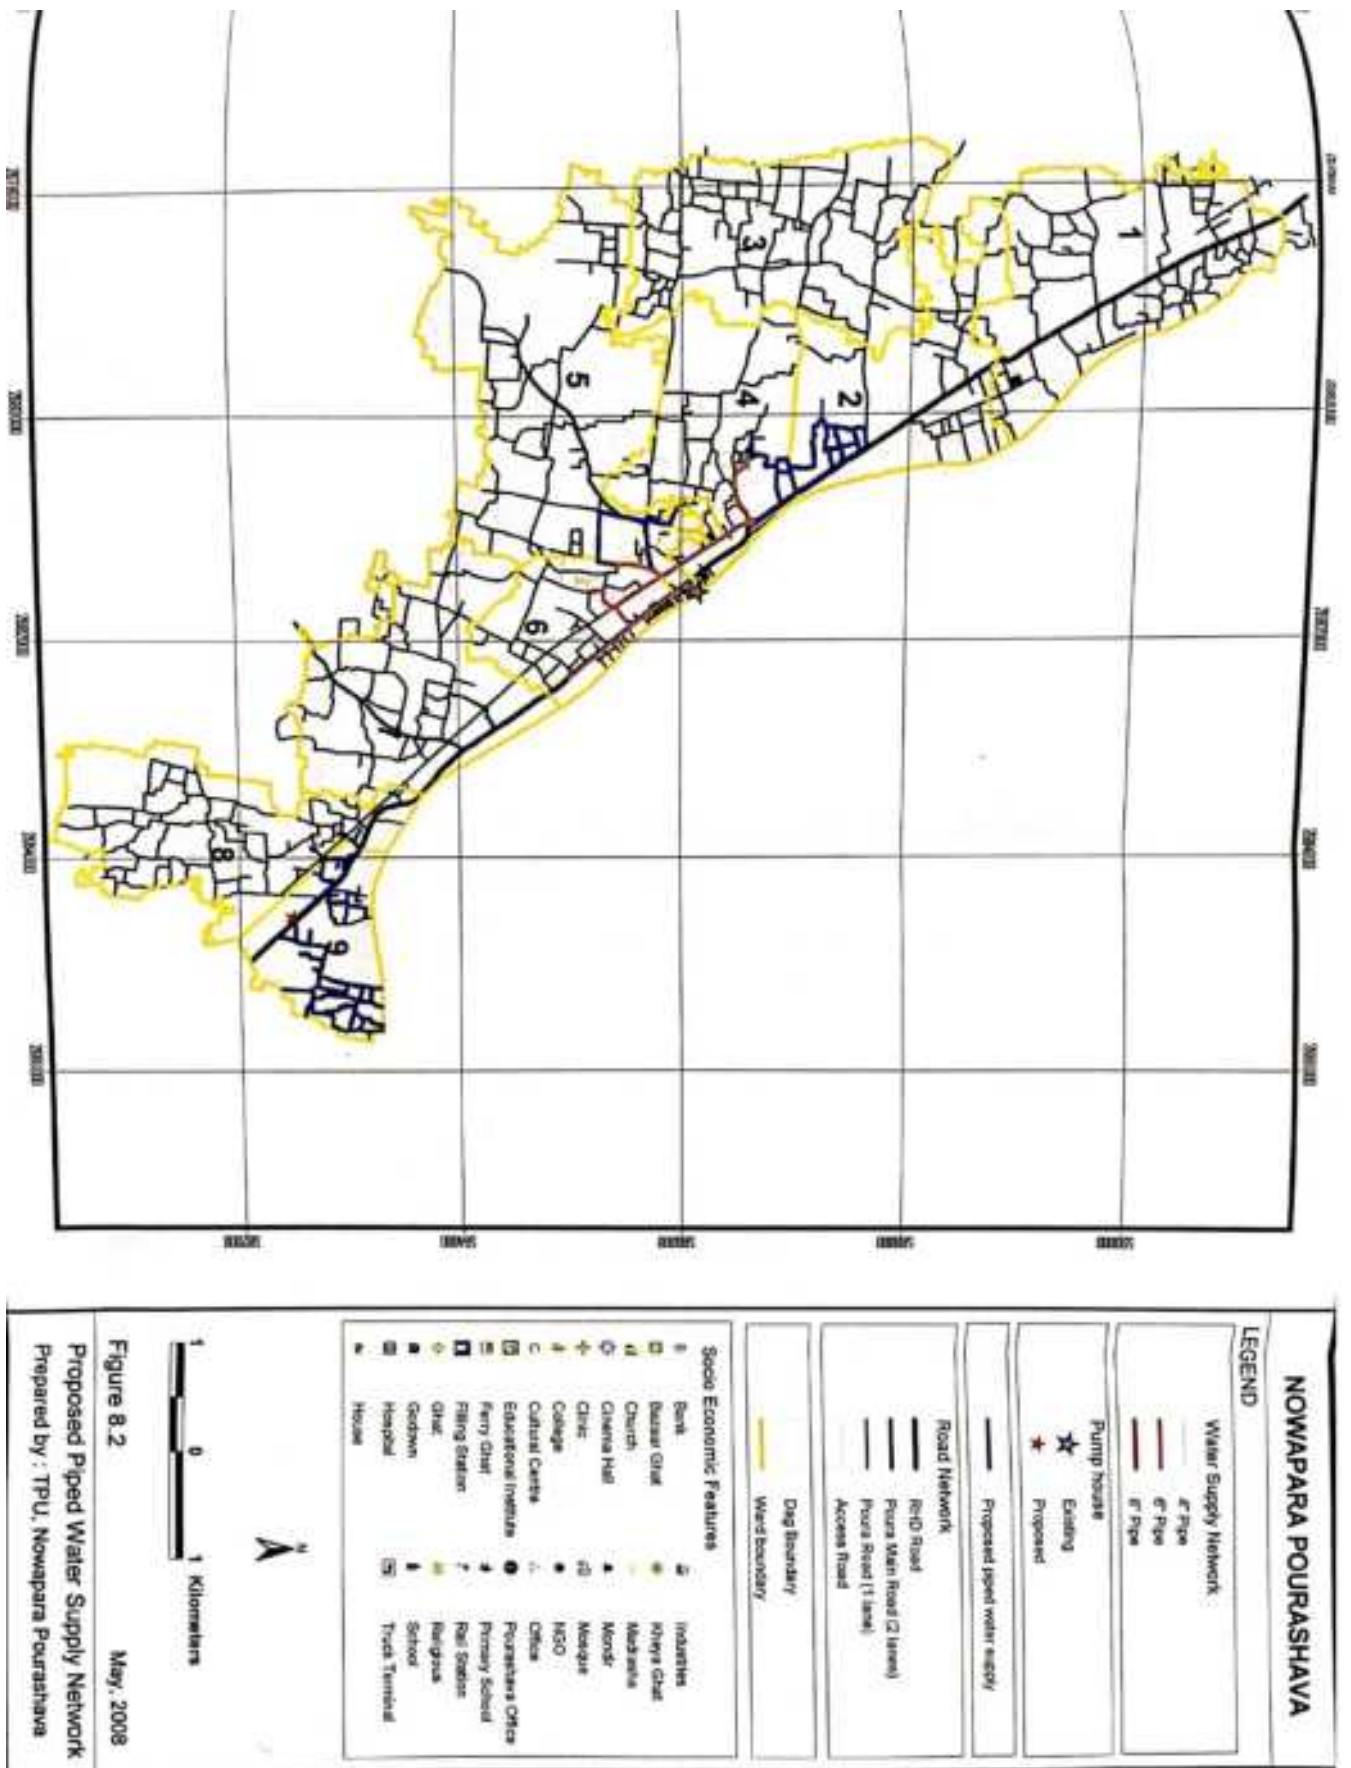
The proposed water supply system of Nowapara Paurashava
